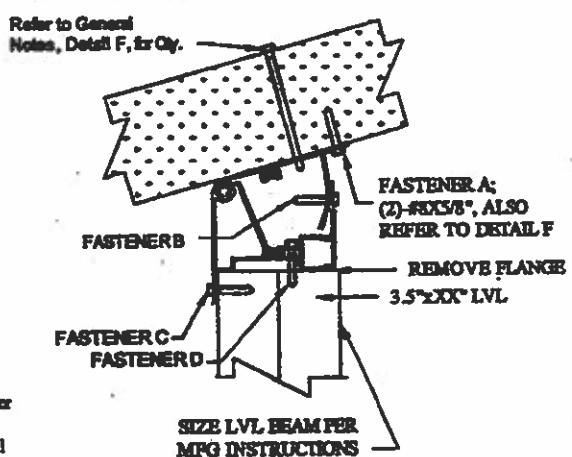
HORIZ. & VERT. POST CONNECTION
